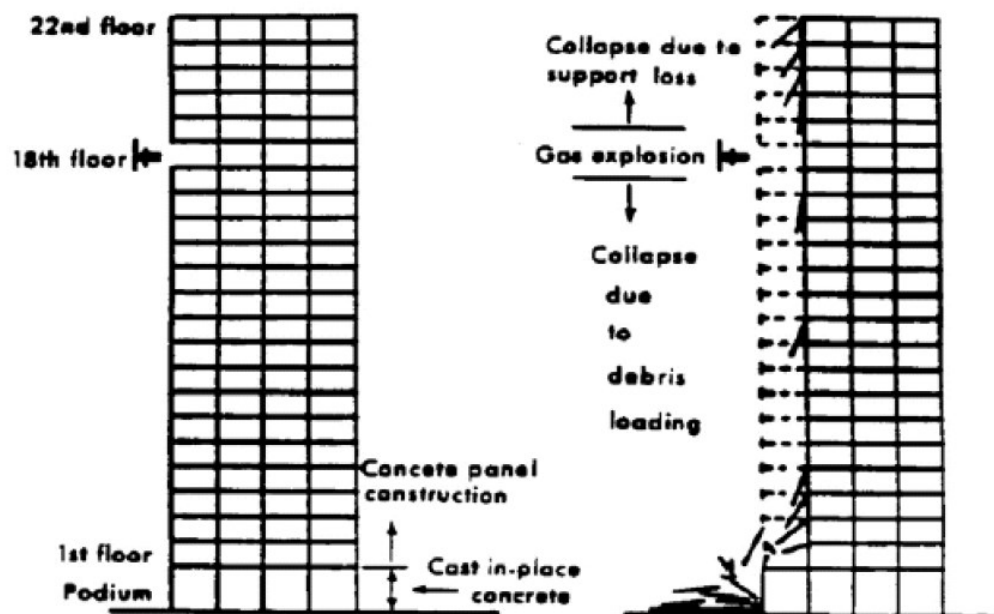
Ronan Point location of failure and ensuing collapse (Crowder, 2005, p.7)
